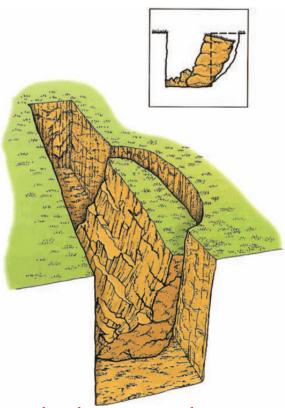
All practicable steps must be taken to prevent danger to any person in and adjacent to the excavation, to ensure that no excavation or part of it collapses (Hughes, et al., 2008).
